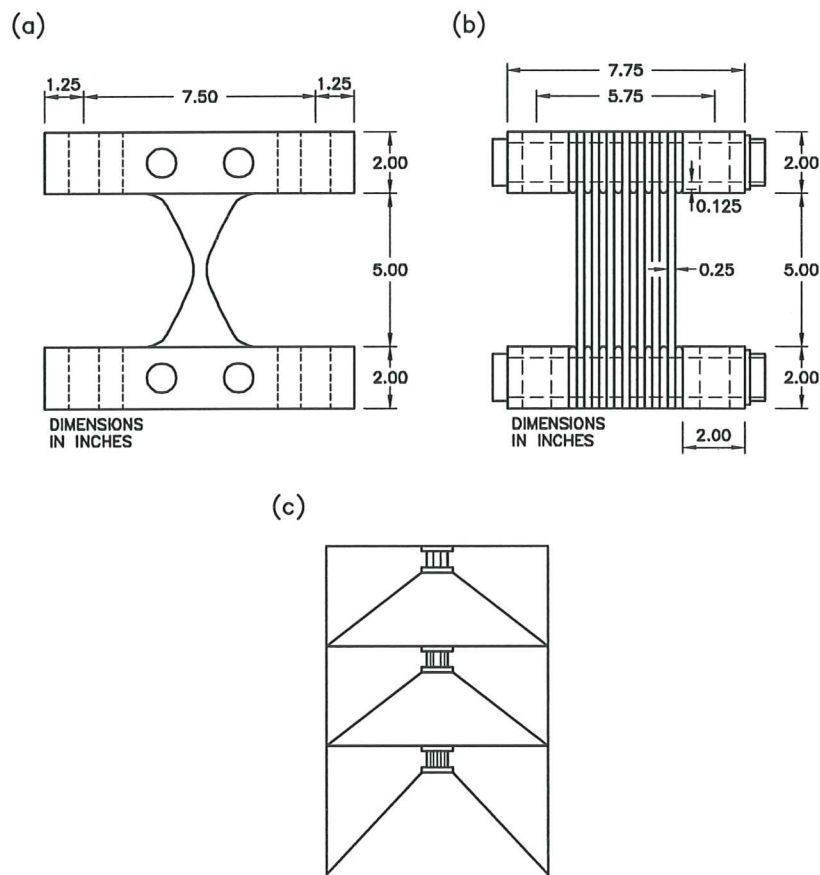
ADAS system. (a) Dimensions. (b) Typical connection with parallel plates. (c) Conventional localisation of the connection in a frame.
